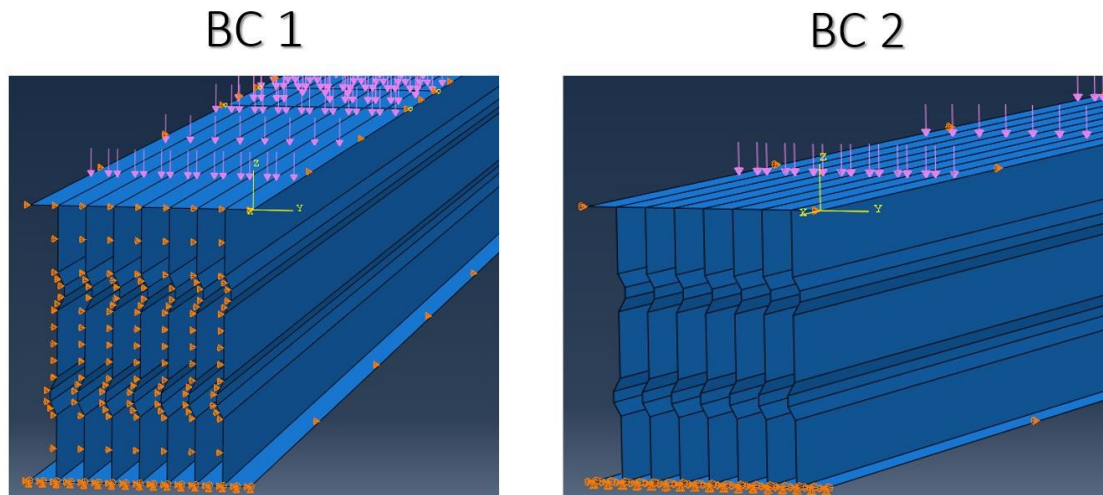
Boundary conditions for the 1 m width bridge deck section.
